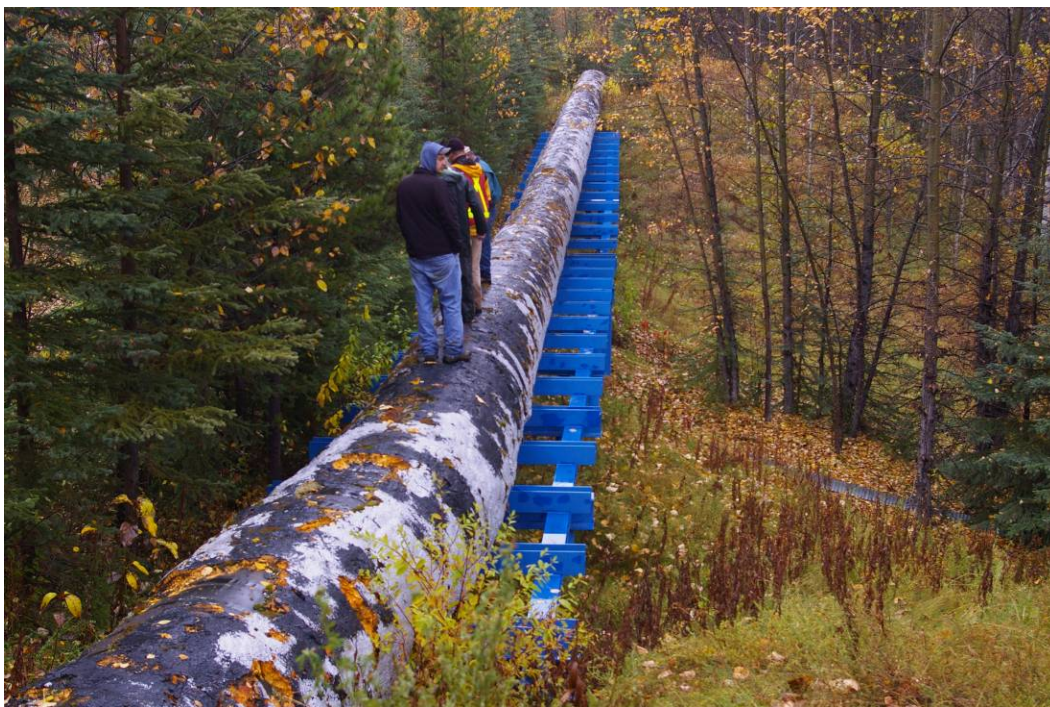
(October 9, 2007) Pipeline Trestle (looking downstream)
